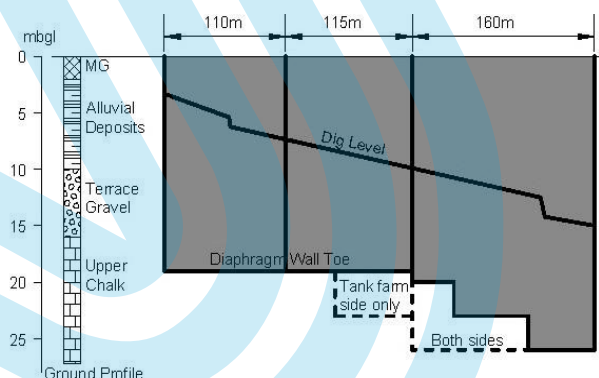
Long section showing dig level, diaphragm wall toe, end walls and cross cut-offs.
